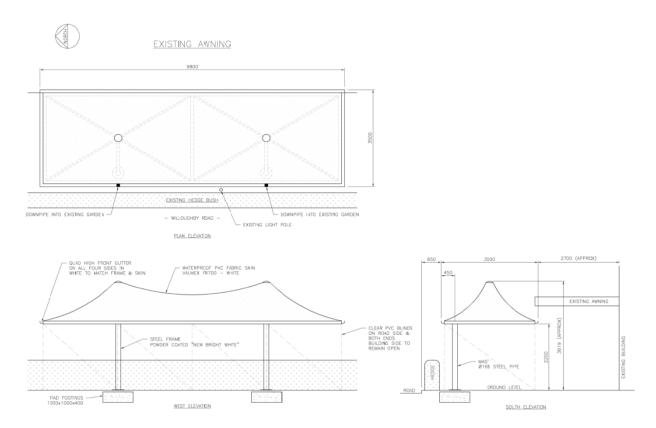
Proposed Shading Structure on Council's Footpath along Willoughby Road.
